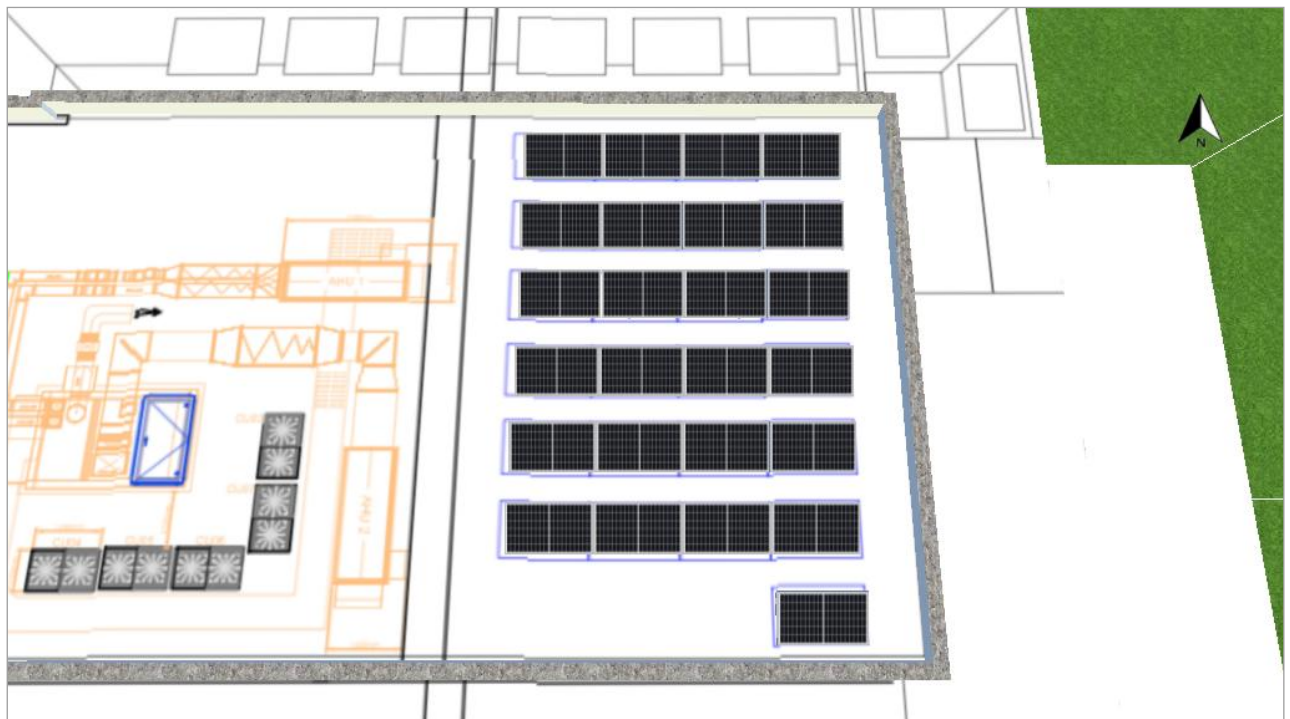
Module Area - Arbitrary Building 02-Mounting Surface South
